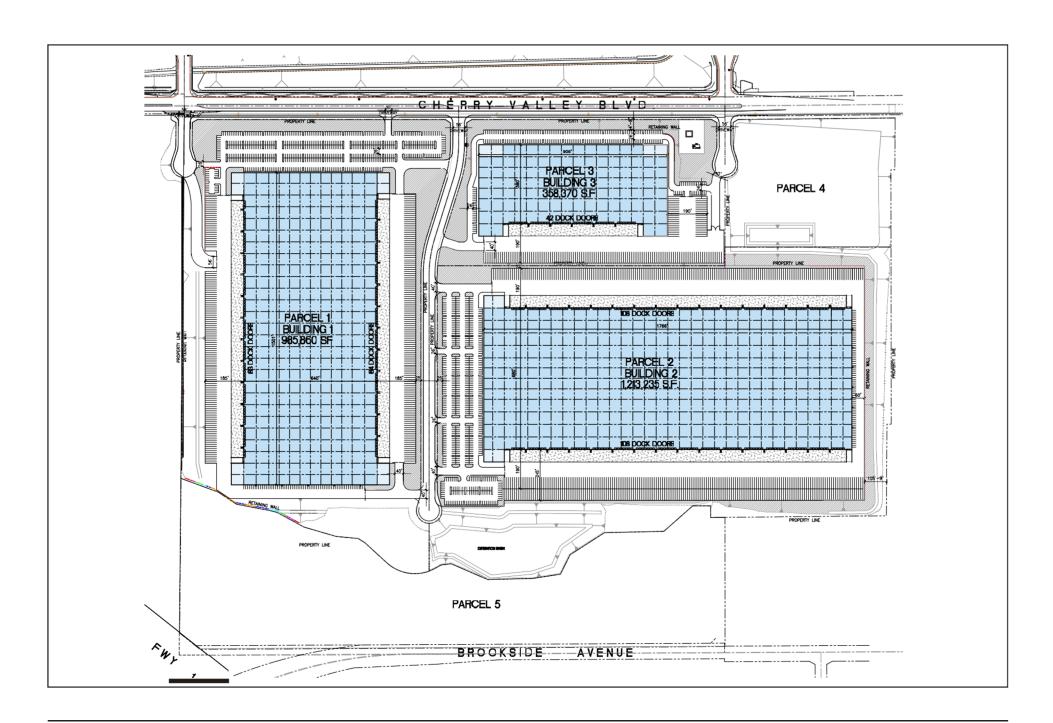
Amended and Restated Specific Plan Land Use Plan Beaumont Summit Station Project City of Beaumont, California
